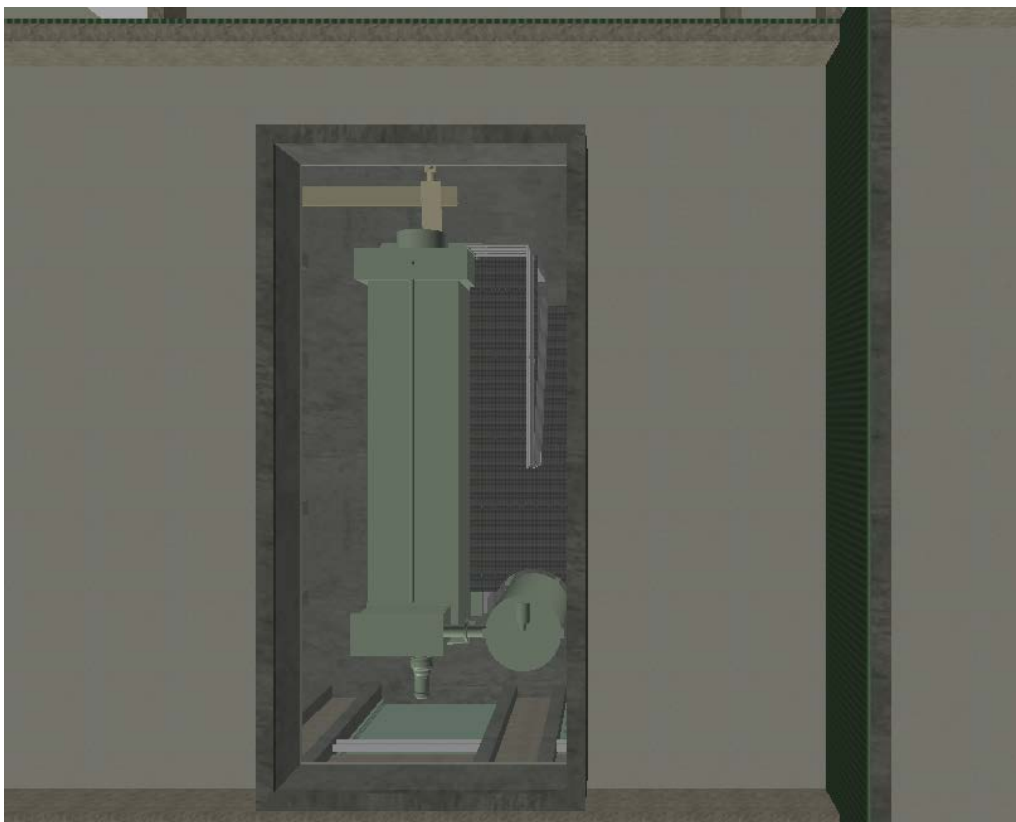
Plan View (from Above Roof) of FKC Screw Press Conceptual Layout in Centrifuge Room
